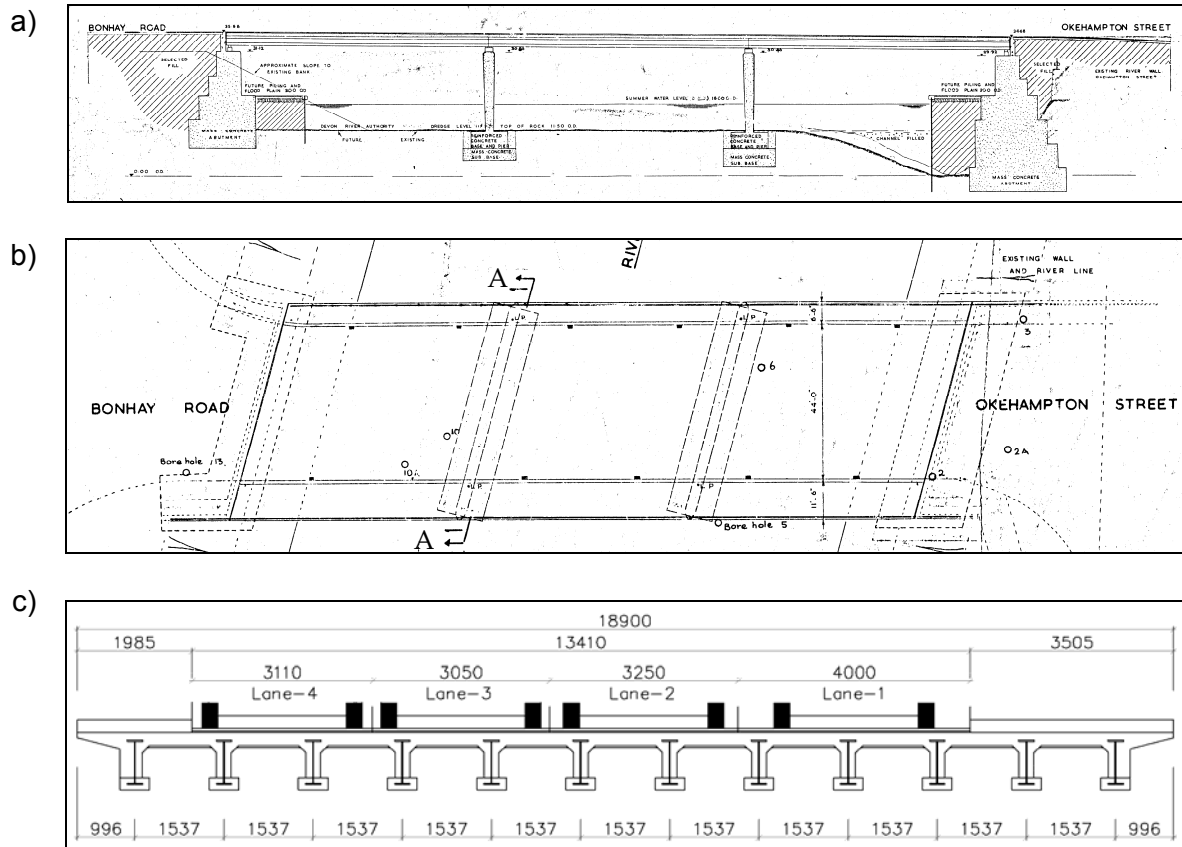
(a) Bridge elevation. (b) Plan view of Exe North Bridge (c) Cross section of superstructure.
